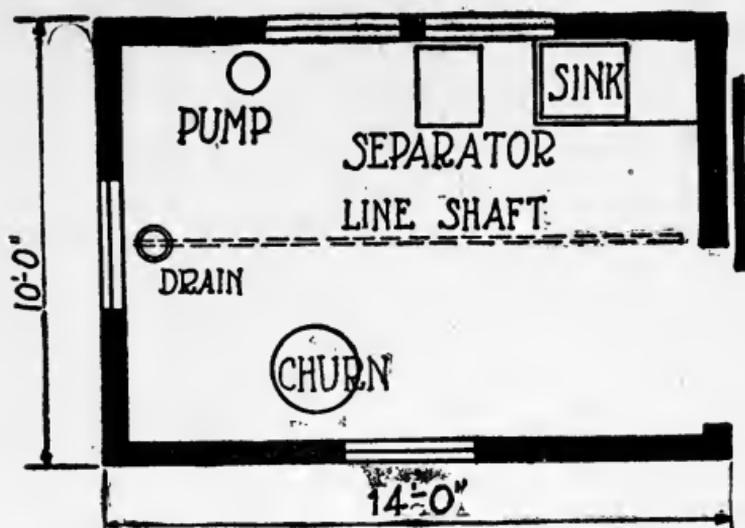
Floor Plan of Pump House, Showing the Placing of the Churn, Pump, Separator, Lineshaft, Drain, etc.
